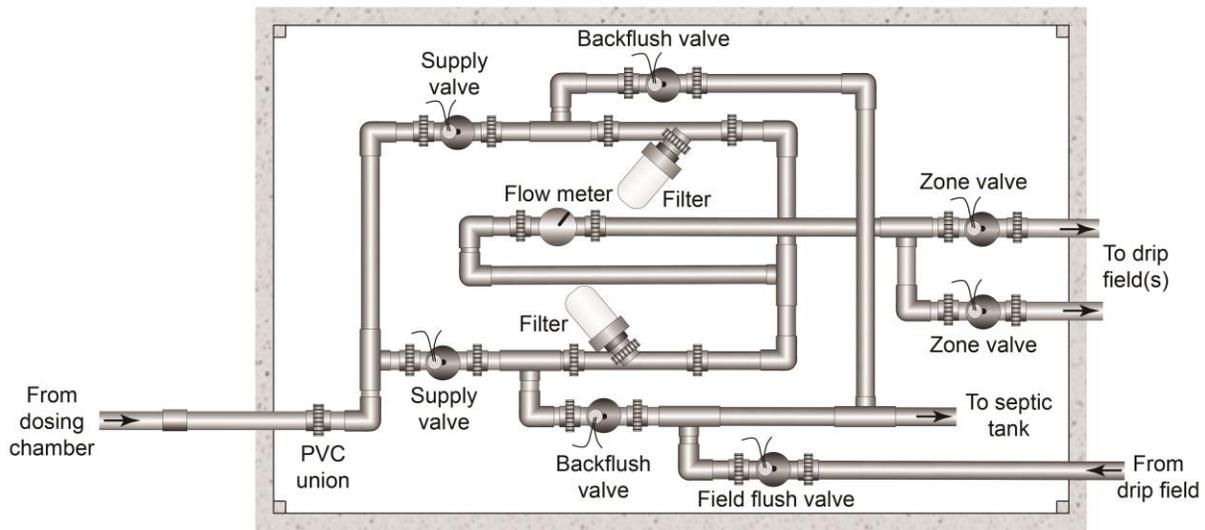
Overhead view of filter, valve, and meter assembly for a noncontinuous flush system.
